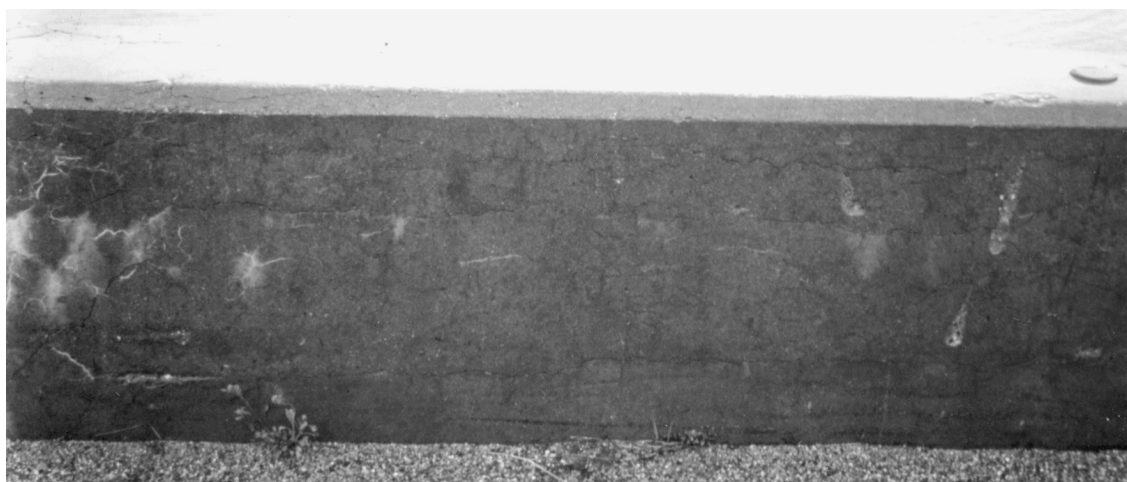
Panel No. 43-3 (Notice Efflorescence, Pattern Cracking, and Change of Color)
